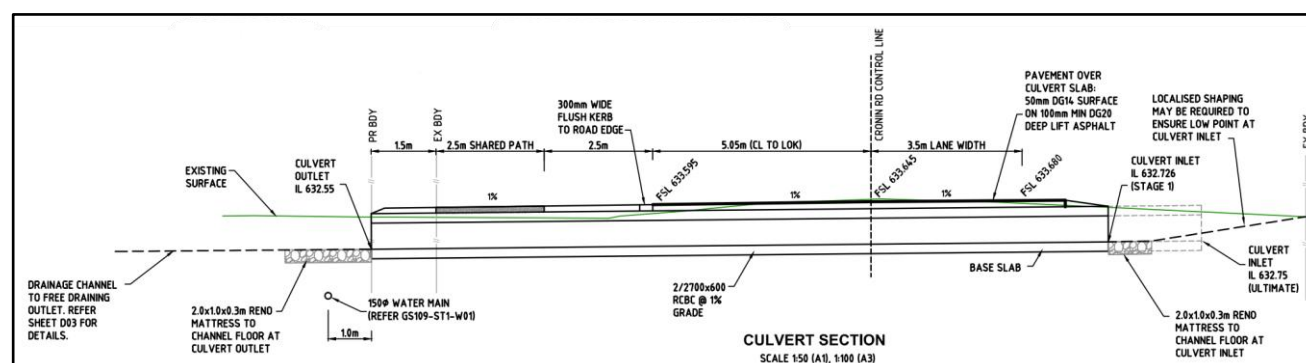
EXISTING CULVERT DESIGN DETAILS (GENENG SOLUTIONS)
